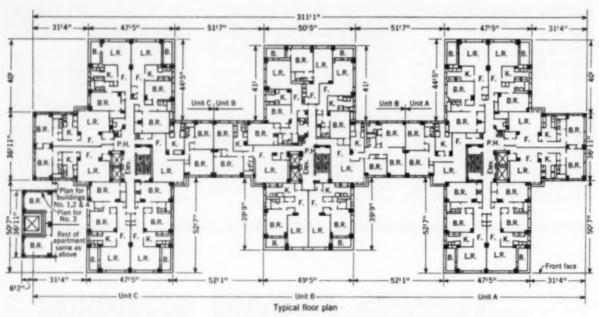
Typical floor plan shows irregular column arrangement permitting maximum latitude in apartment layout.
